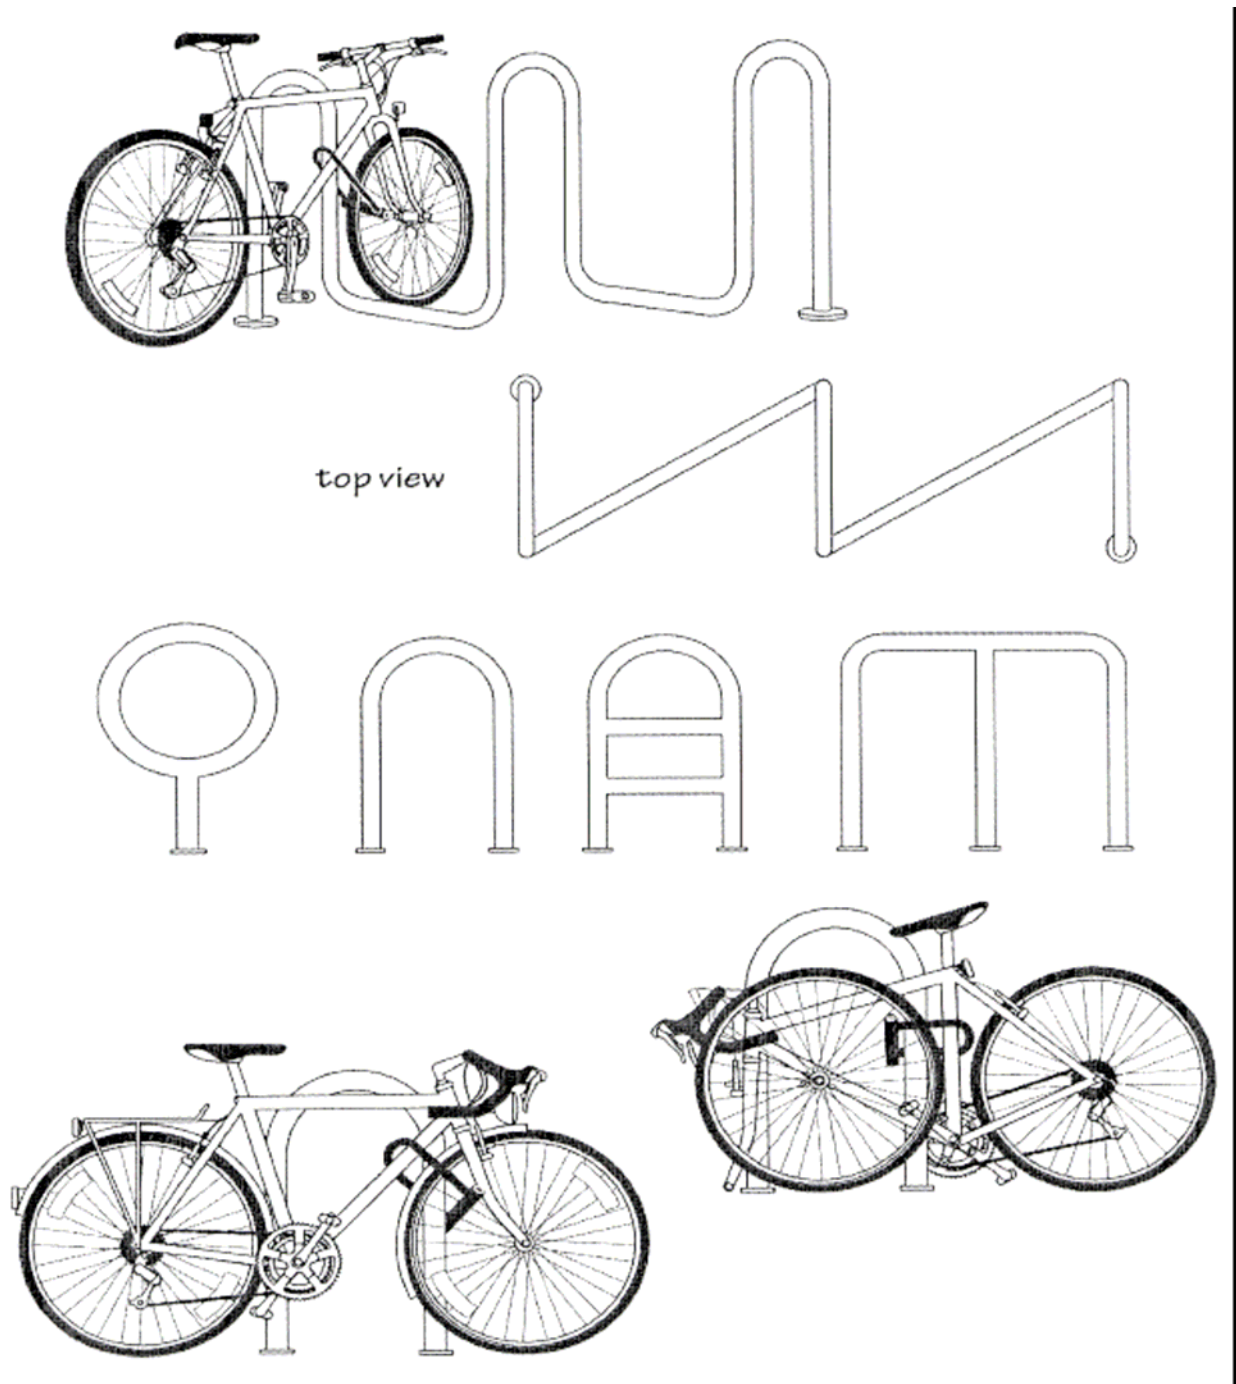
Examples of Acceptable Bike Rack Design continued
